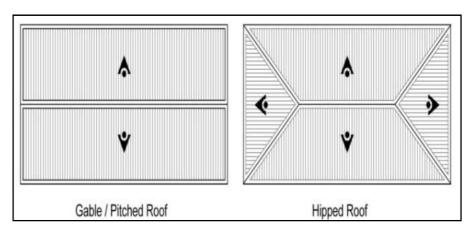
Roof Plans of Typical Colonial Igala Building. Source: Field Survey (2017).
